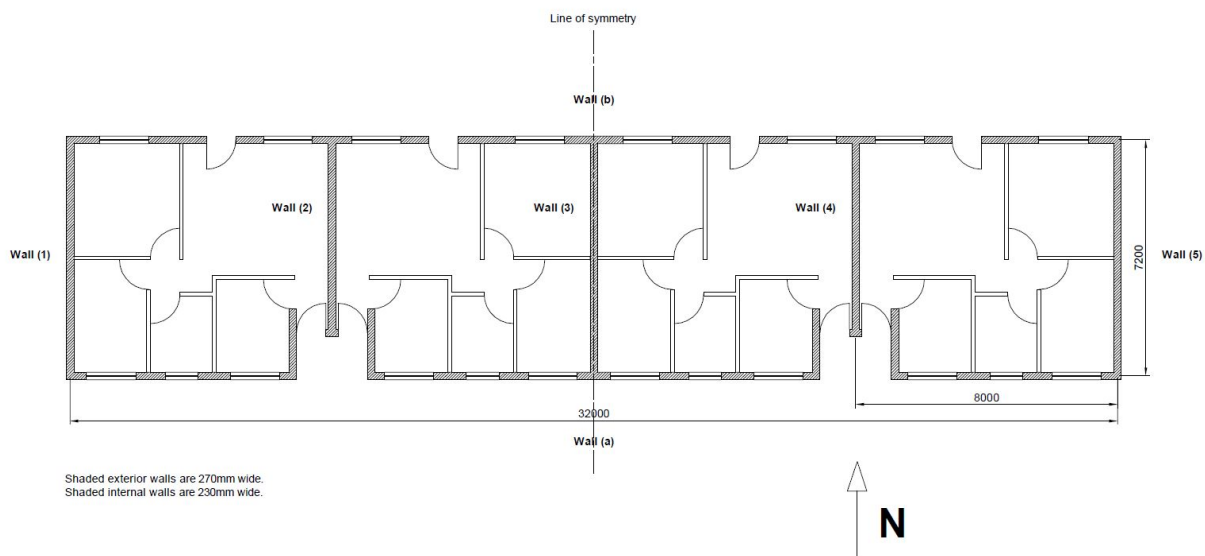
General floor plan of the buildings in the Cape Flats area Van der Kolf (2014)
